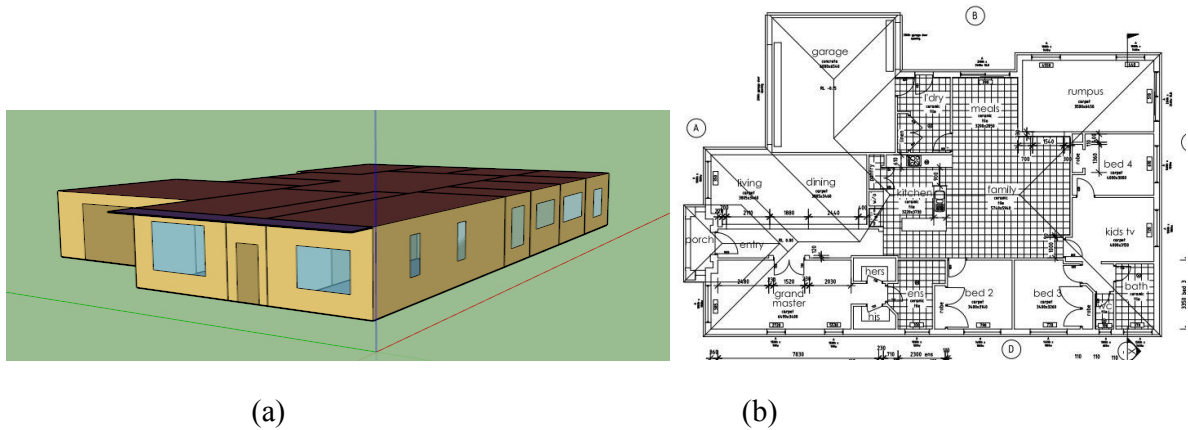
A typical modern four bedroom house in Australia (a) floor plan [9] and (b) geometry of basecase house model.
